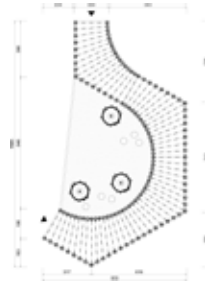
WUST Pavilion, version 2, plan view of the whole pavilion, 2014
